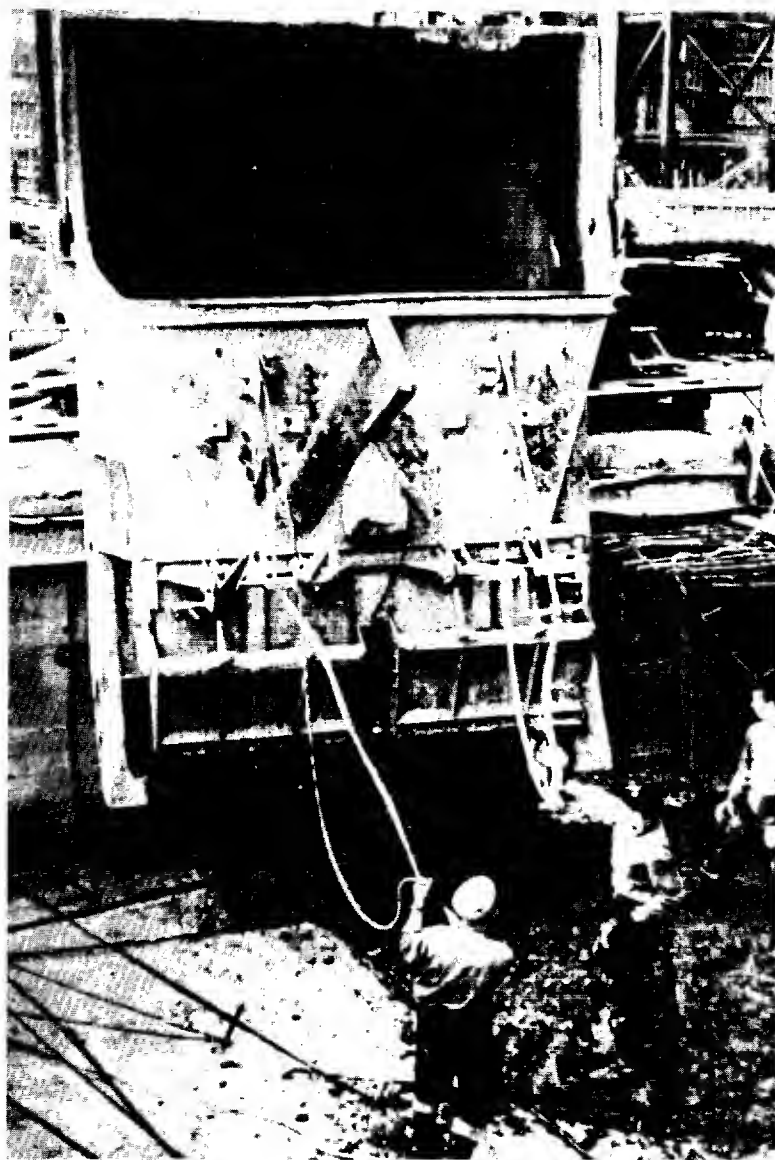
This 8-1/2 cubic-yard bucket used to place concrete at Bratsk Dam is of unique design
